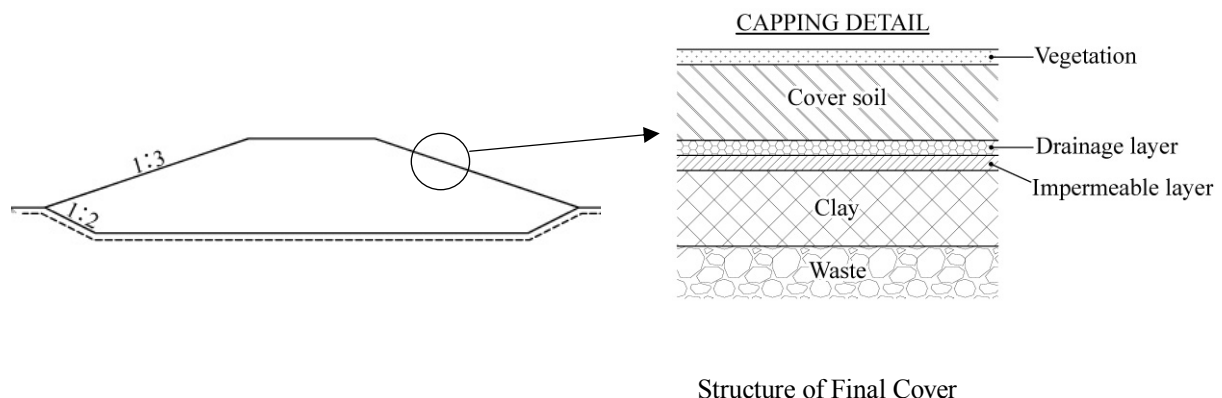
Cross Section of Landfill and Structure of Final Cover
